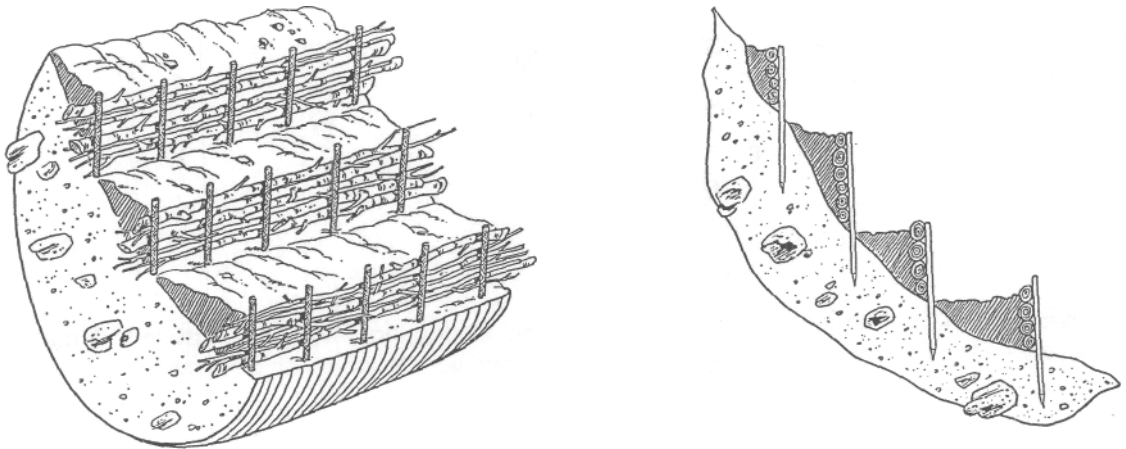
Wattle fences are short retaining walls constructed of living cuttings. They are used to provide slopes, which will support plant growth where oversteepened slopes are preventing plant establishment. The section shows the effects of steeper slopes on wattle fence spacing.
